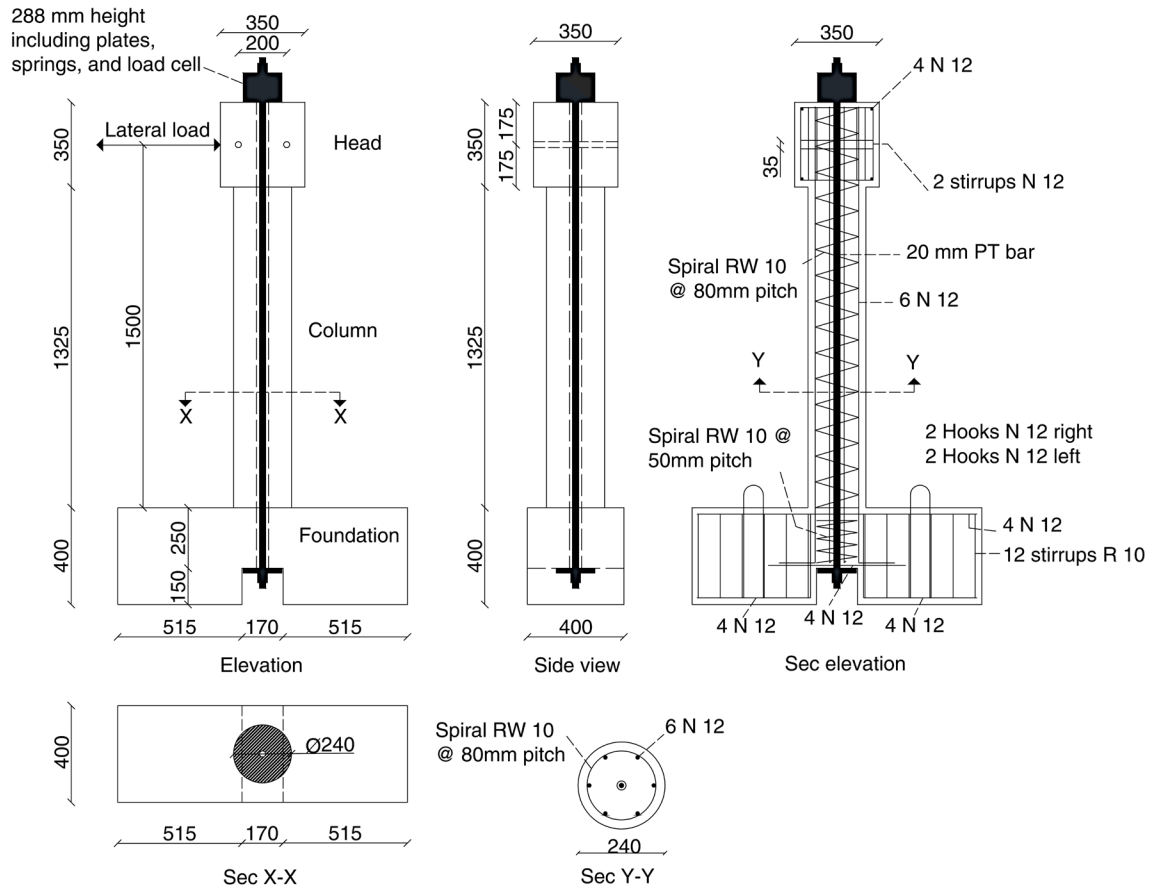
Column configurations and reinforcement details (units are in mm) [9].
